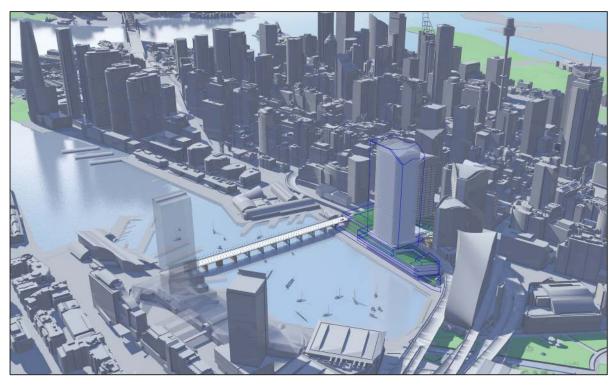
| Perspective aerial view looking north-east across Darling Harbour and the CBD (Source: Applicant's Amended EIS)
